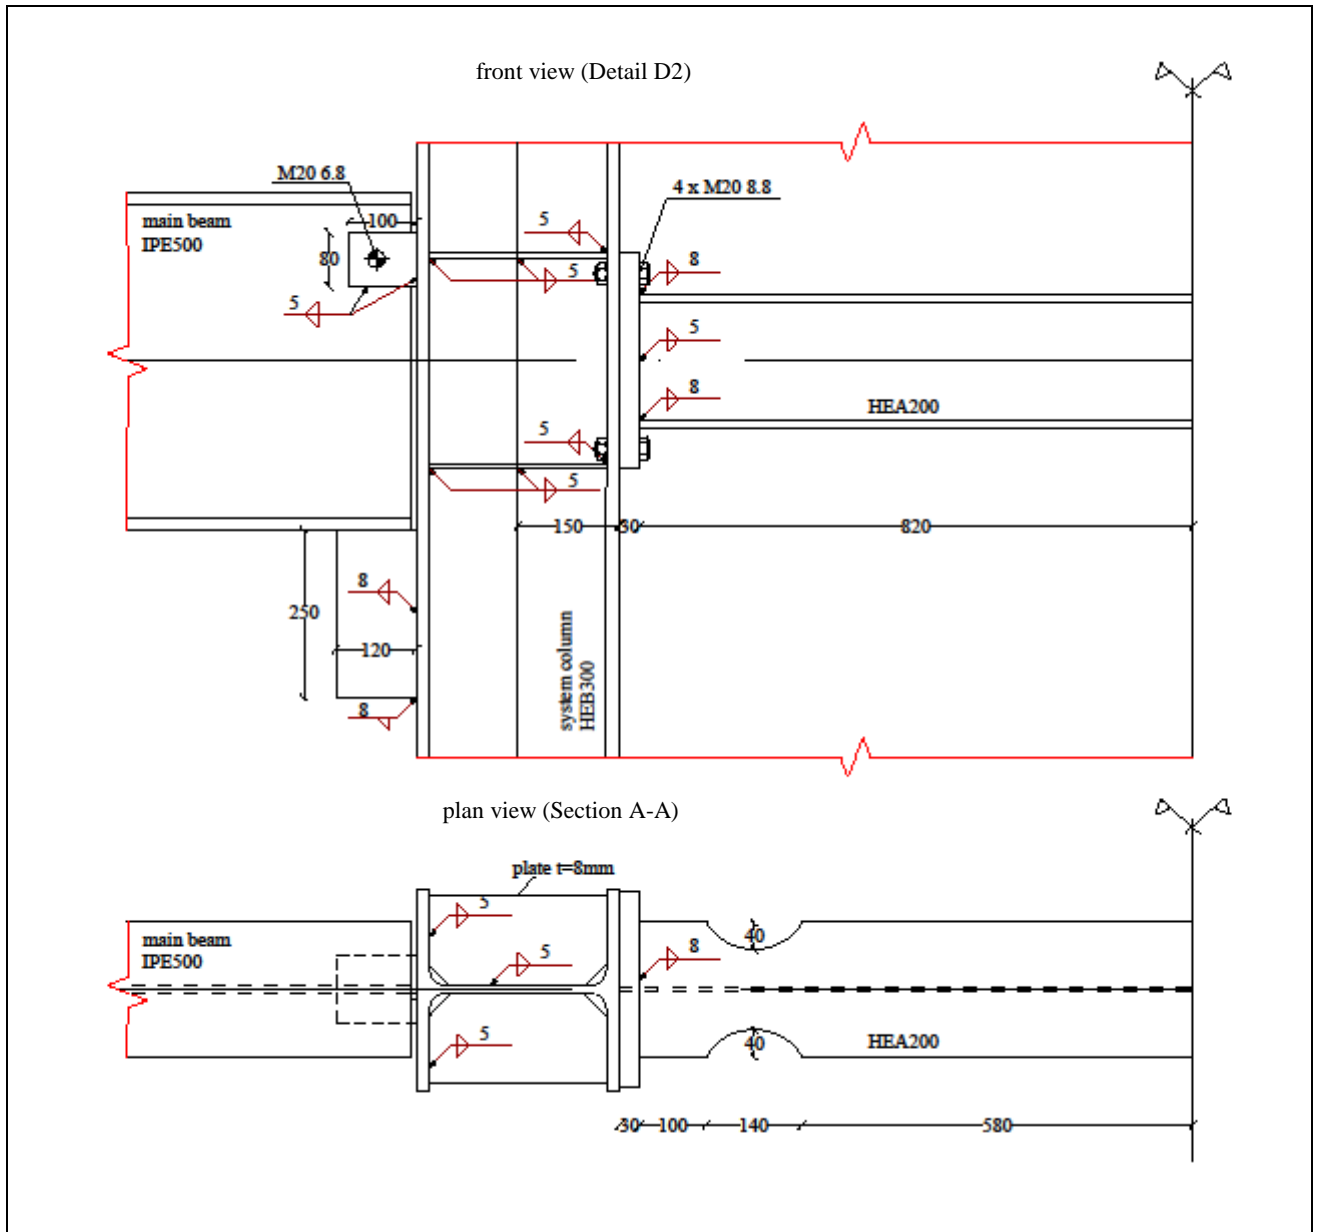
Side view and plan view of a typical FUSEIS beam link
